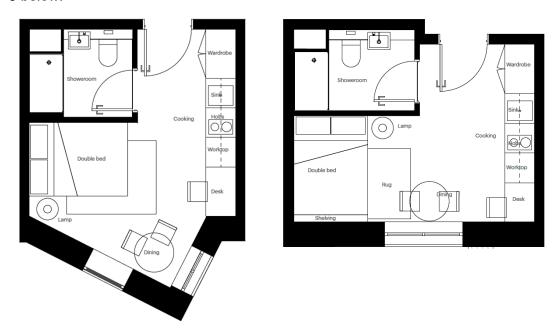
typical room types A (right) and B (left), both at 18 sqm, show the proposed open plan for the rooms.
